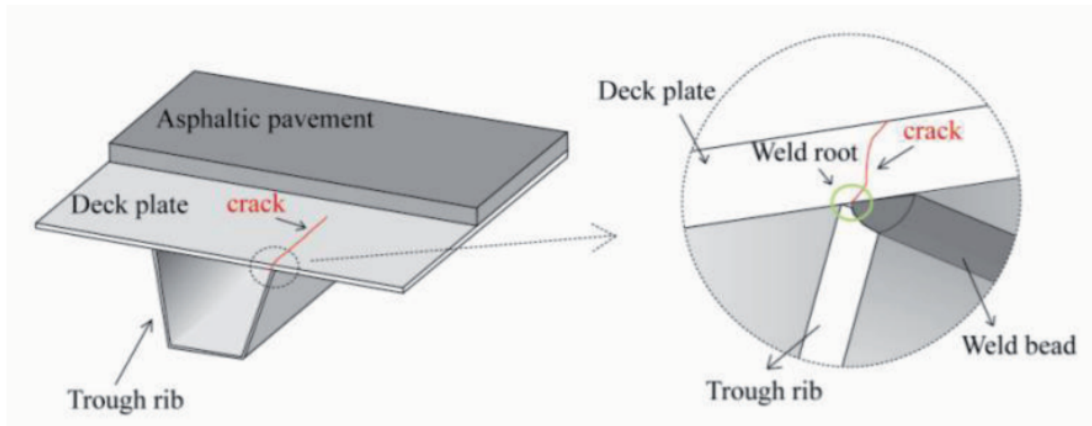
Fully grown crack originating from weld root (Location - Rib to Deck weld) [18]
